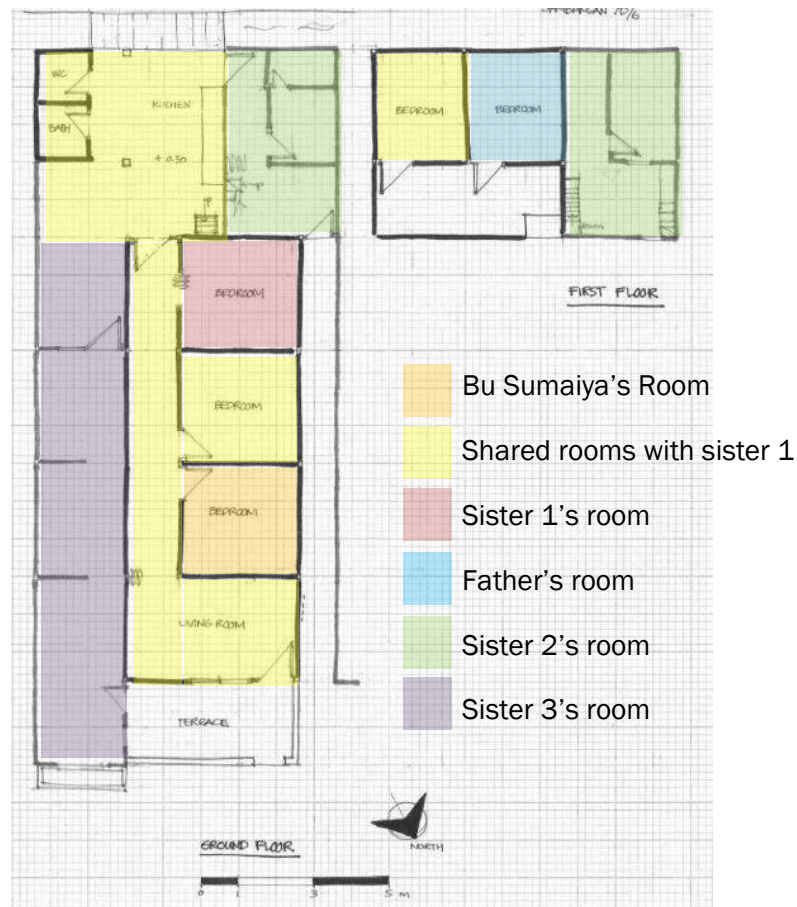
Arrangement of rooms in Bu Sumaiya's house
